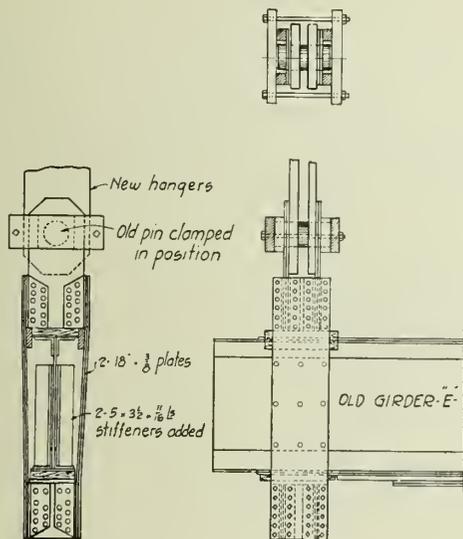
Temporary Connection between old Girder *E* and new Hangers.
